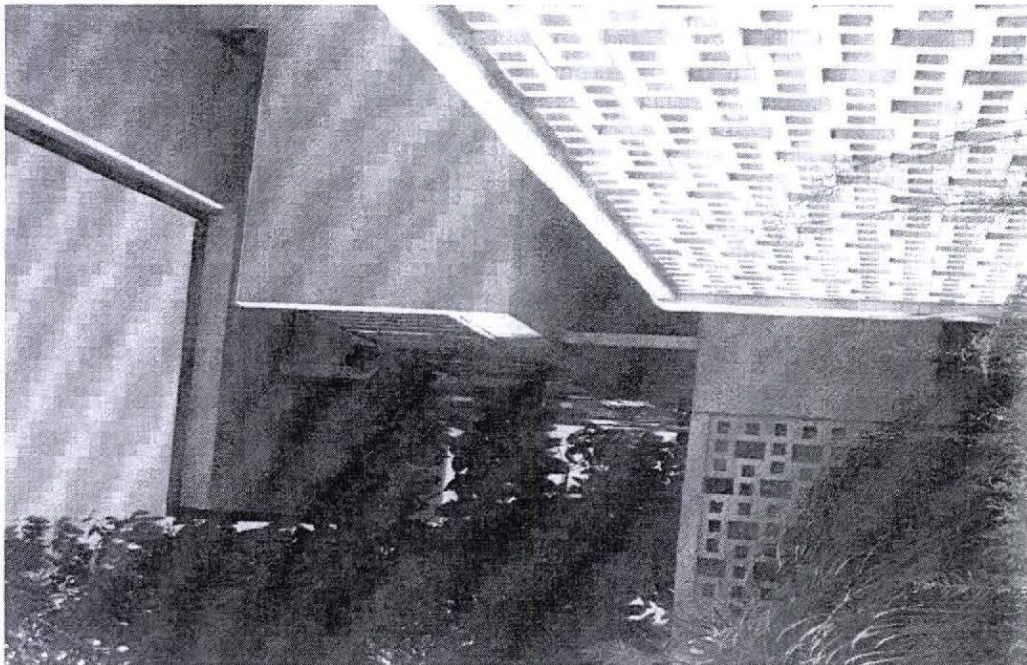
Building "11"- Two Story Residence Building Close-Up View of Patio Screen Wall and Balcony
